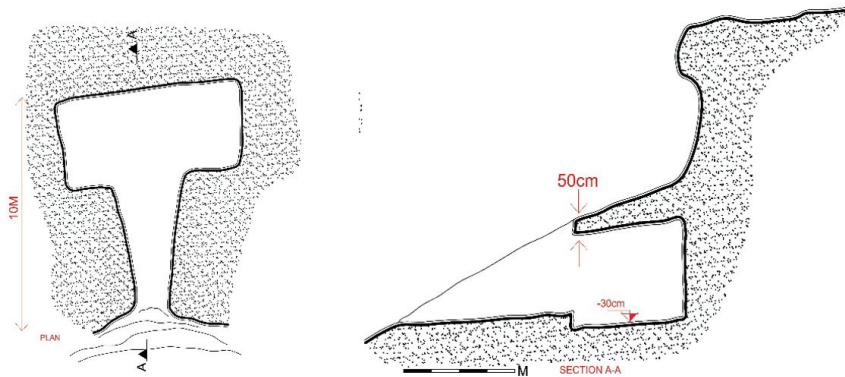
The second stage of excavation (excavation of semi-open space, i.e., Soffeh) in cross-section and plan view.
